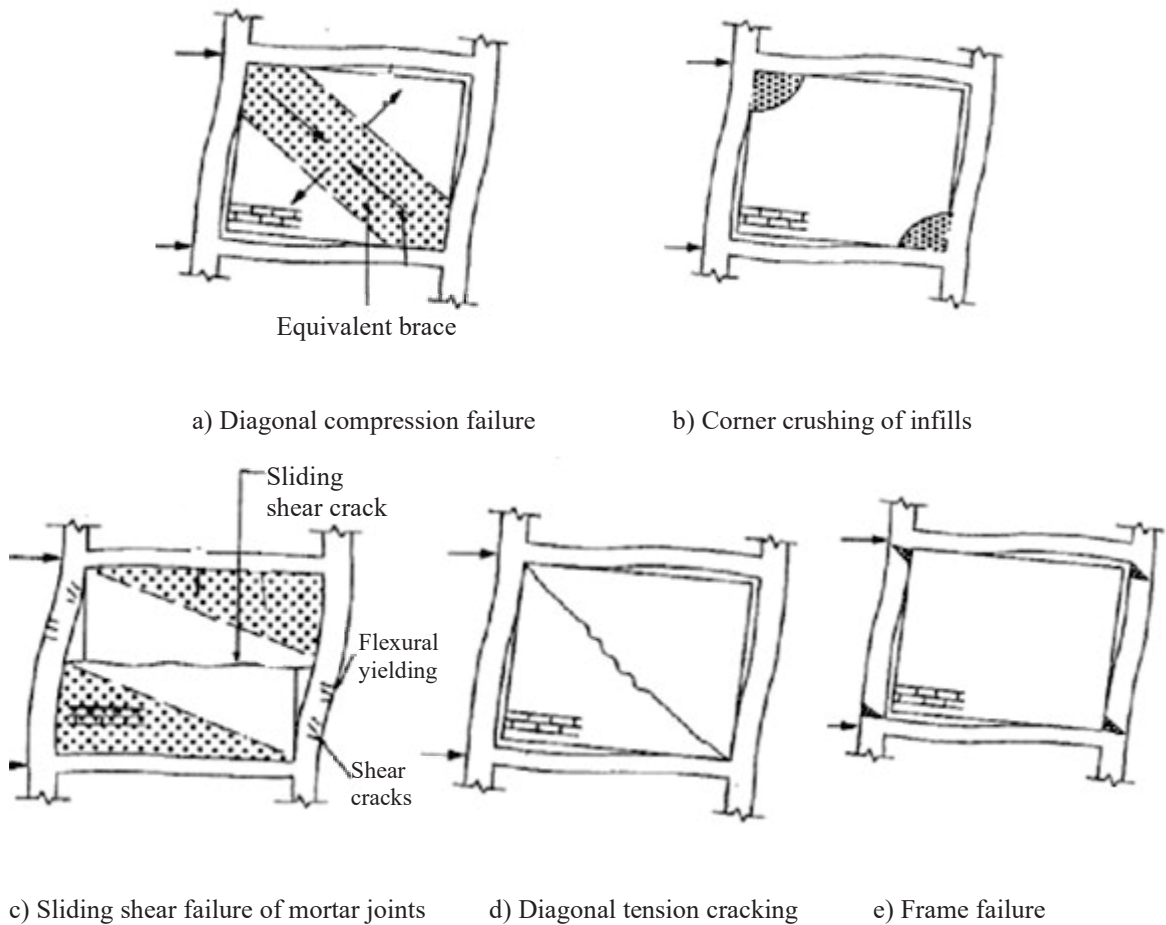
Failure modes of masonry infilled frames (El-Dakhakhni et al., 2003)
